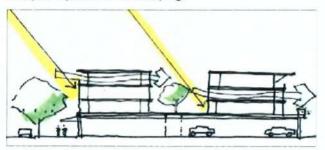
Comfortable separation space allows for sunlight access to individual units and outdoor spaces.
